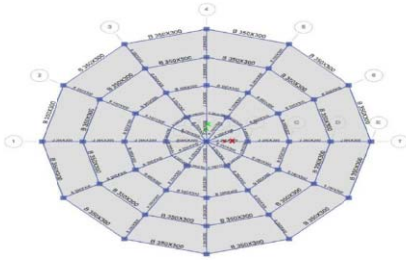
Plan view of 5 stories O-Shape building with and without base isolation
